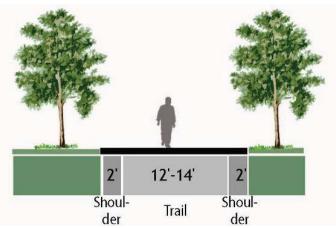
Section 2.1b Widen Existing Greenway Trail through Powers Marine Park
